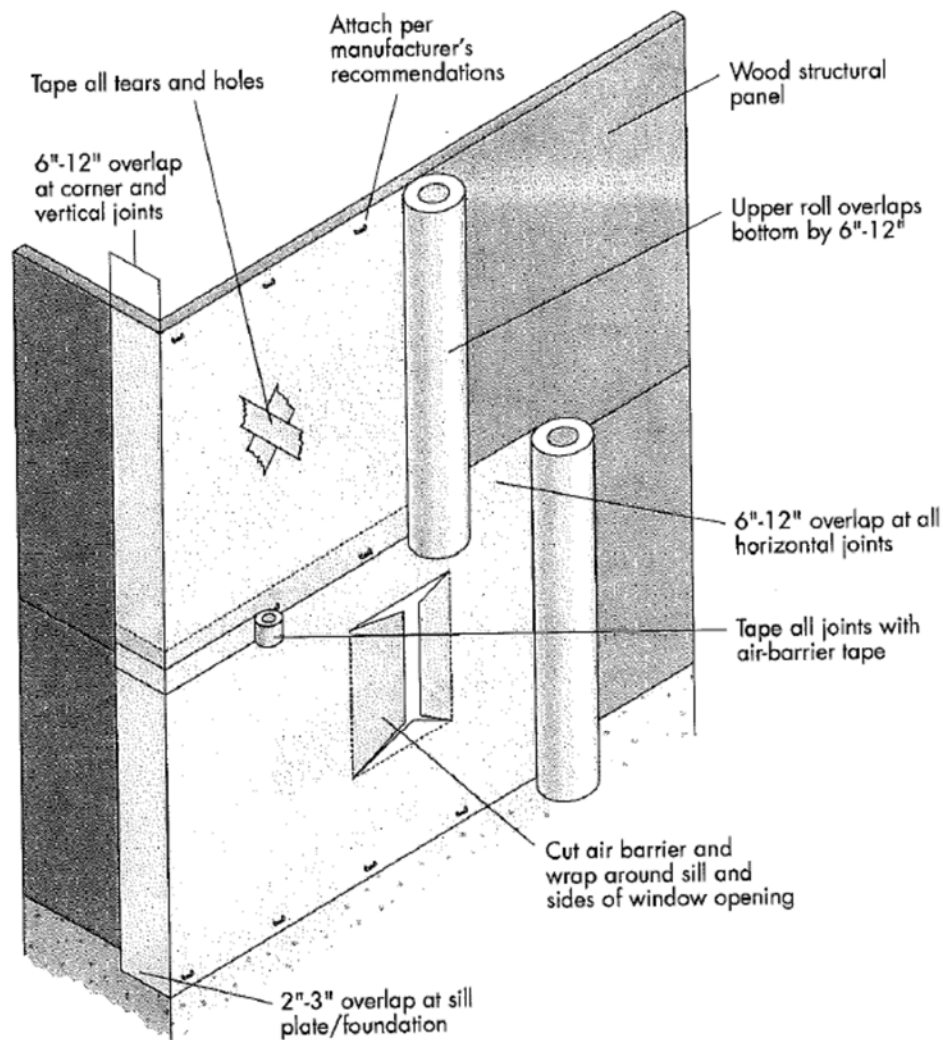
Proper air barrier installation details (two story wall shown—not to scale).
